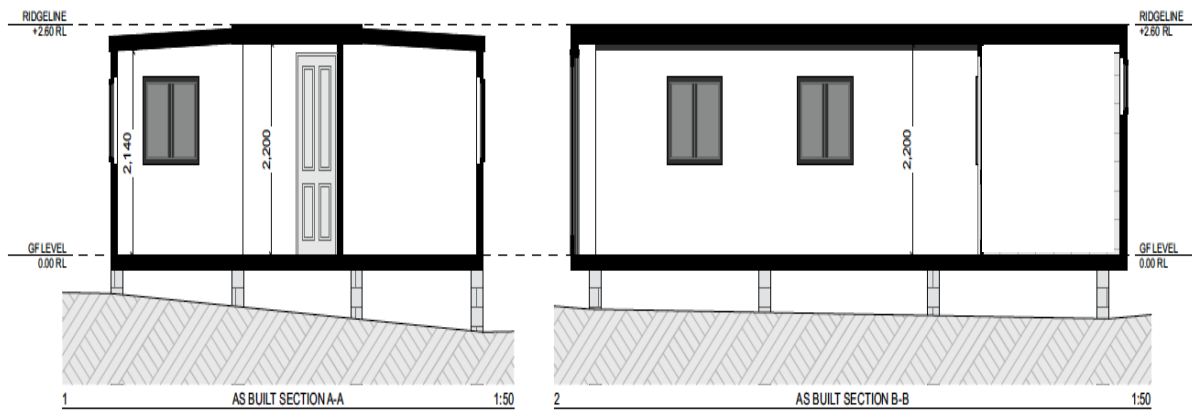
Sections of the temporary dwelling the subject of this retrospective use application
